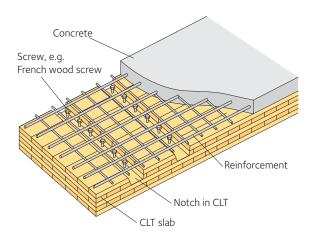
Composite floor structure in CLT and concrete, where the interaction is achieved via a notch in the upper face of the CLT slab.
